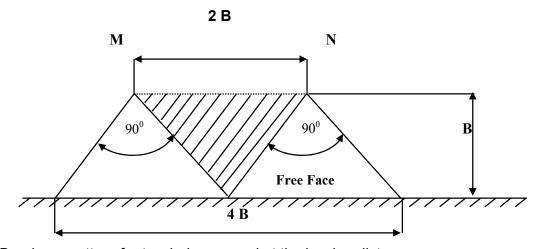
Position of burden & spacing (drilling pattern) in a bench
